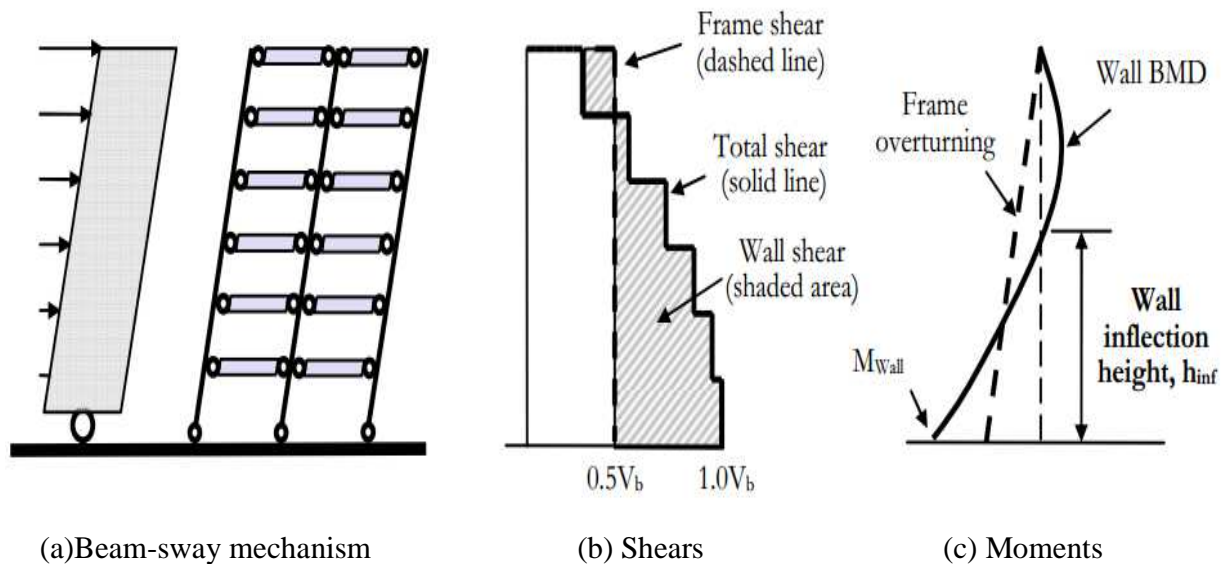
Use of frame-wall strength proportions to locate inflection height in walls
